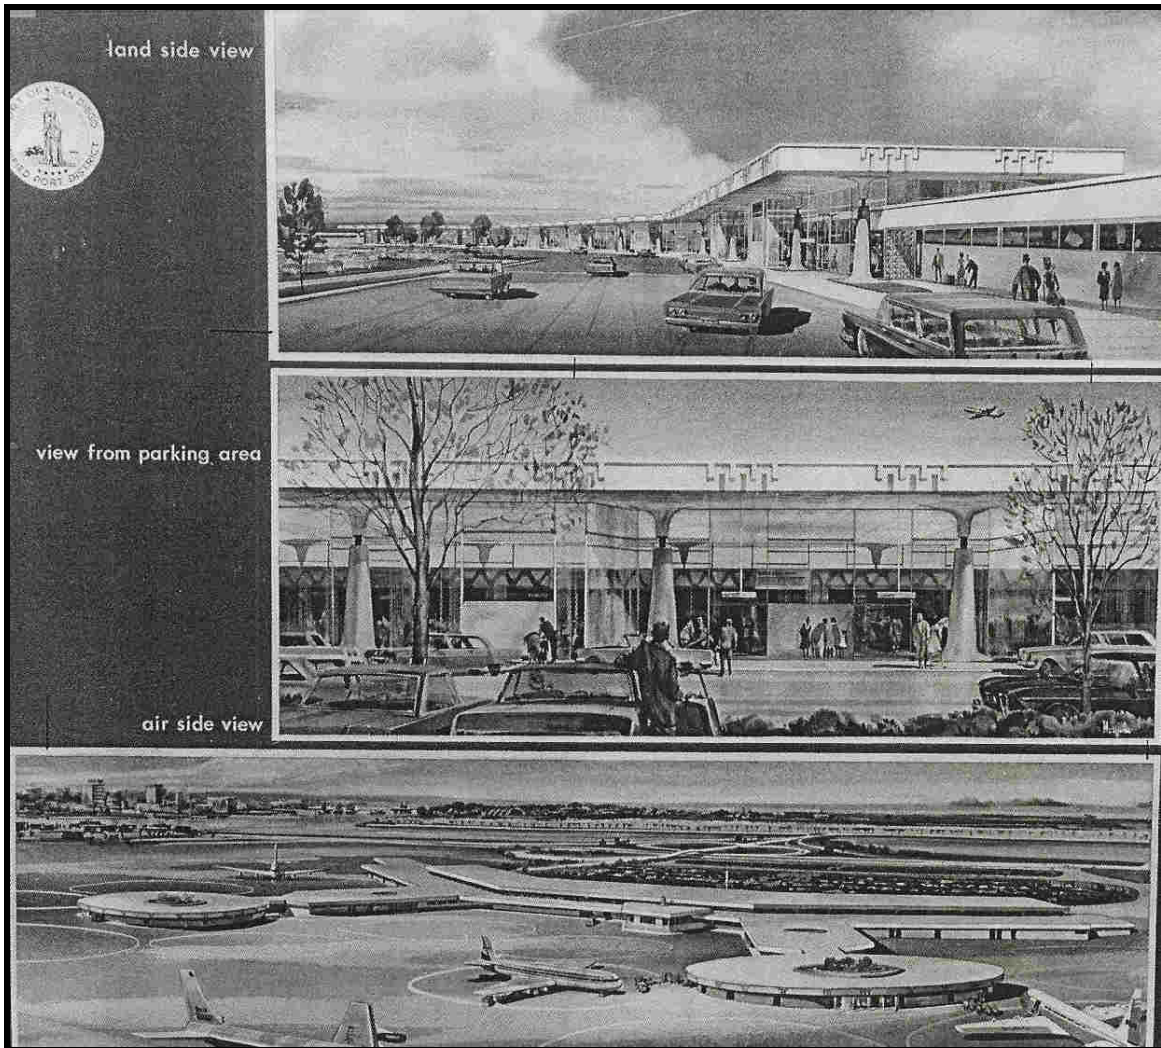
Architects drawings of the new Air Terminal Building completed along Harbor Drive in 1967.
